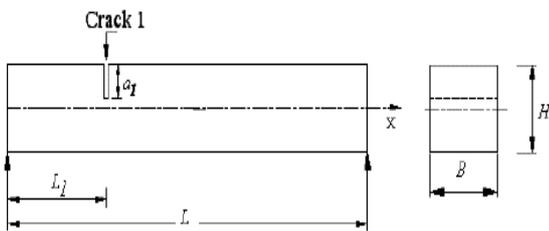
Schematic diagram of a cracked simply supported beam with single cracks [46]
